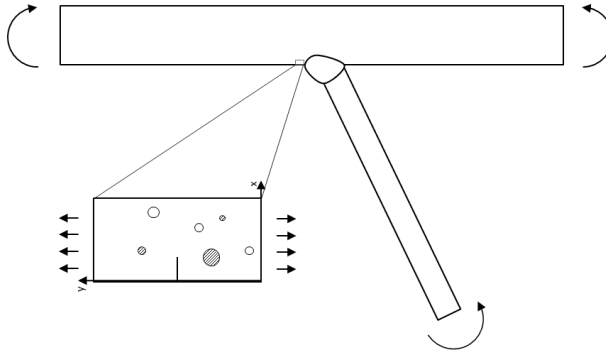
RVE in the rib-to-deck welded joint of OSD
